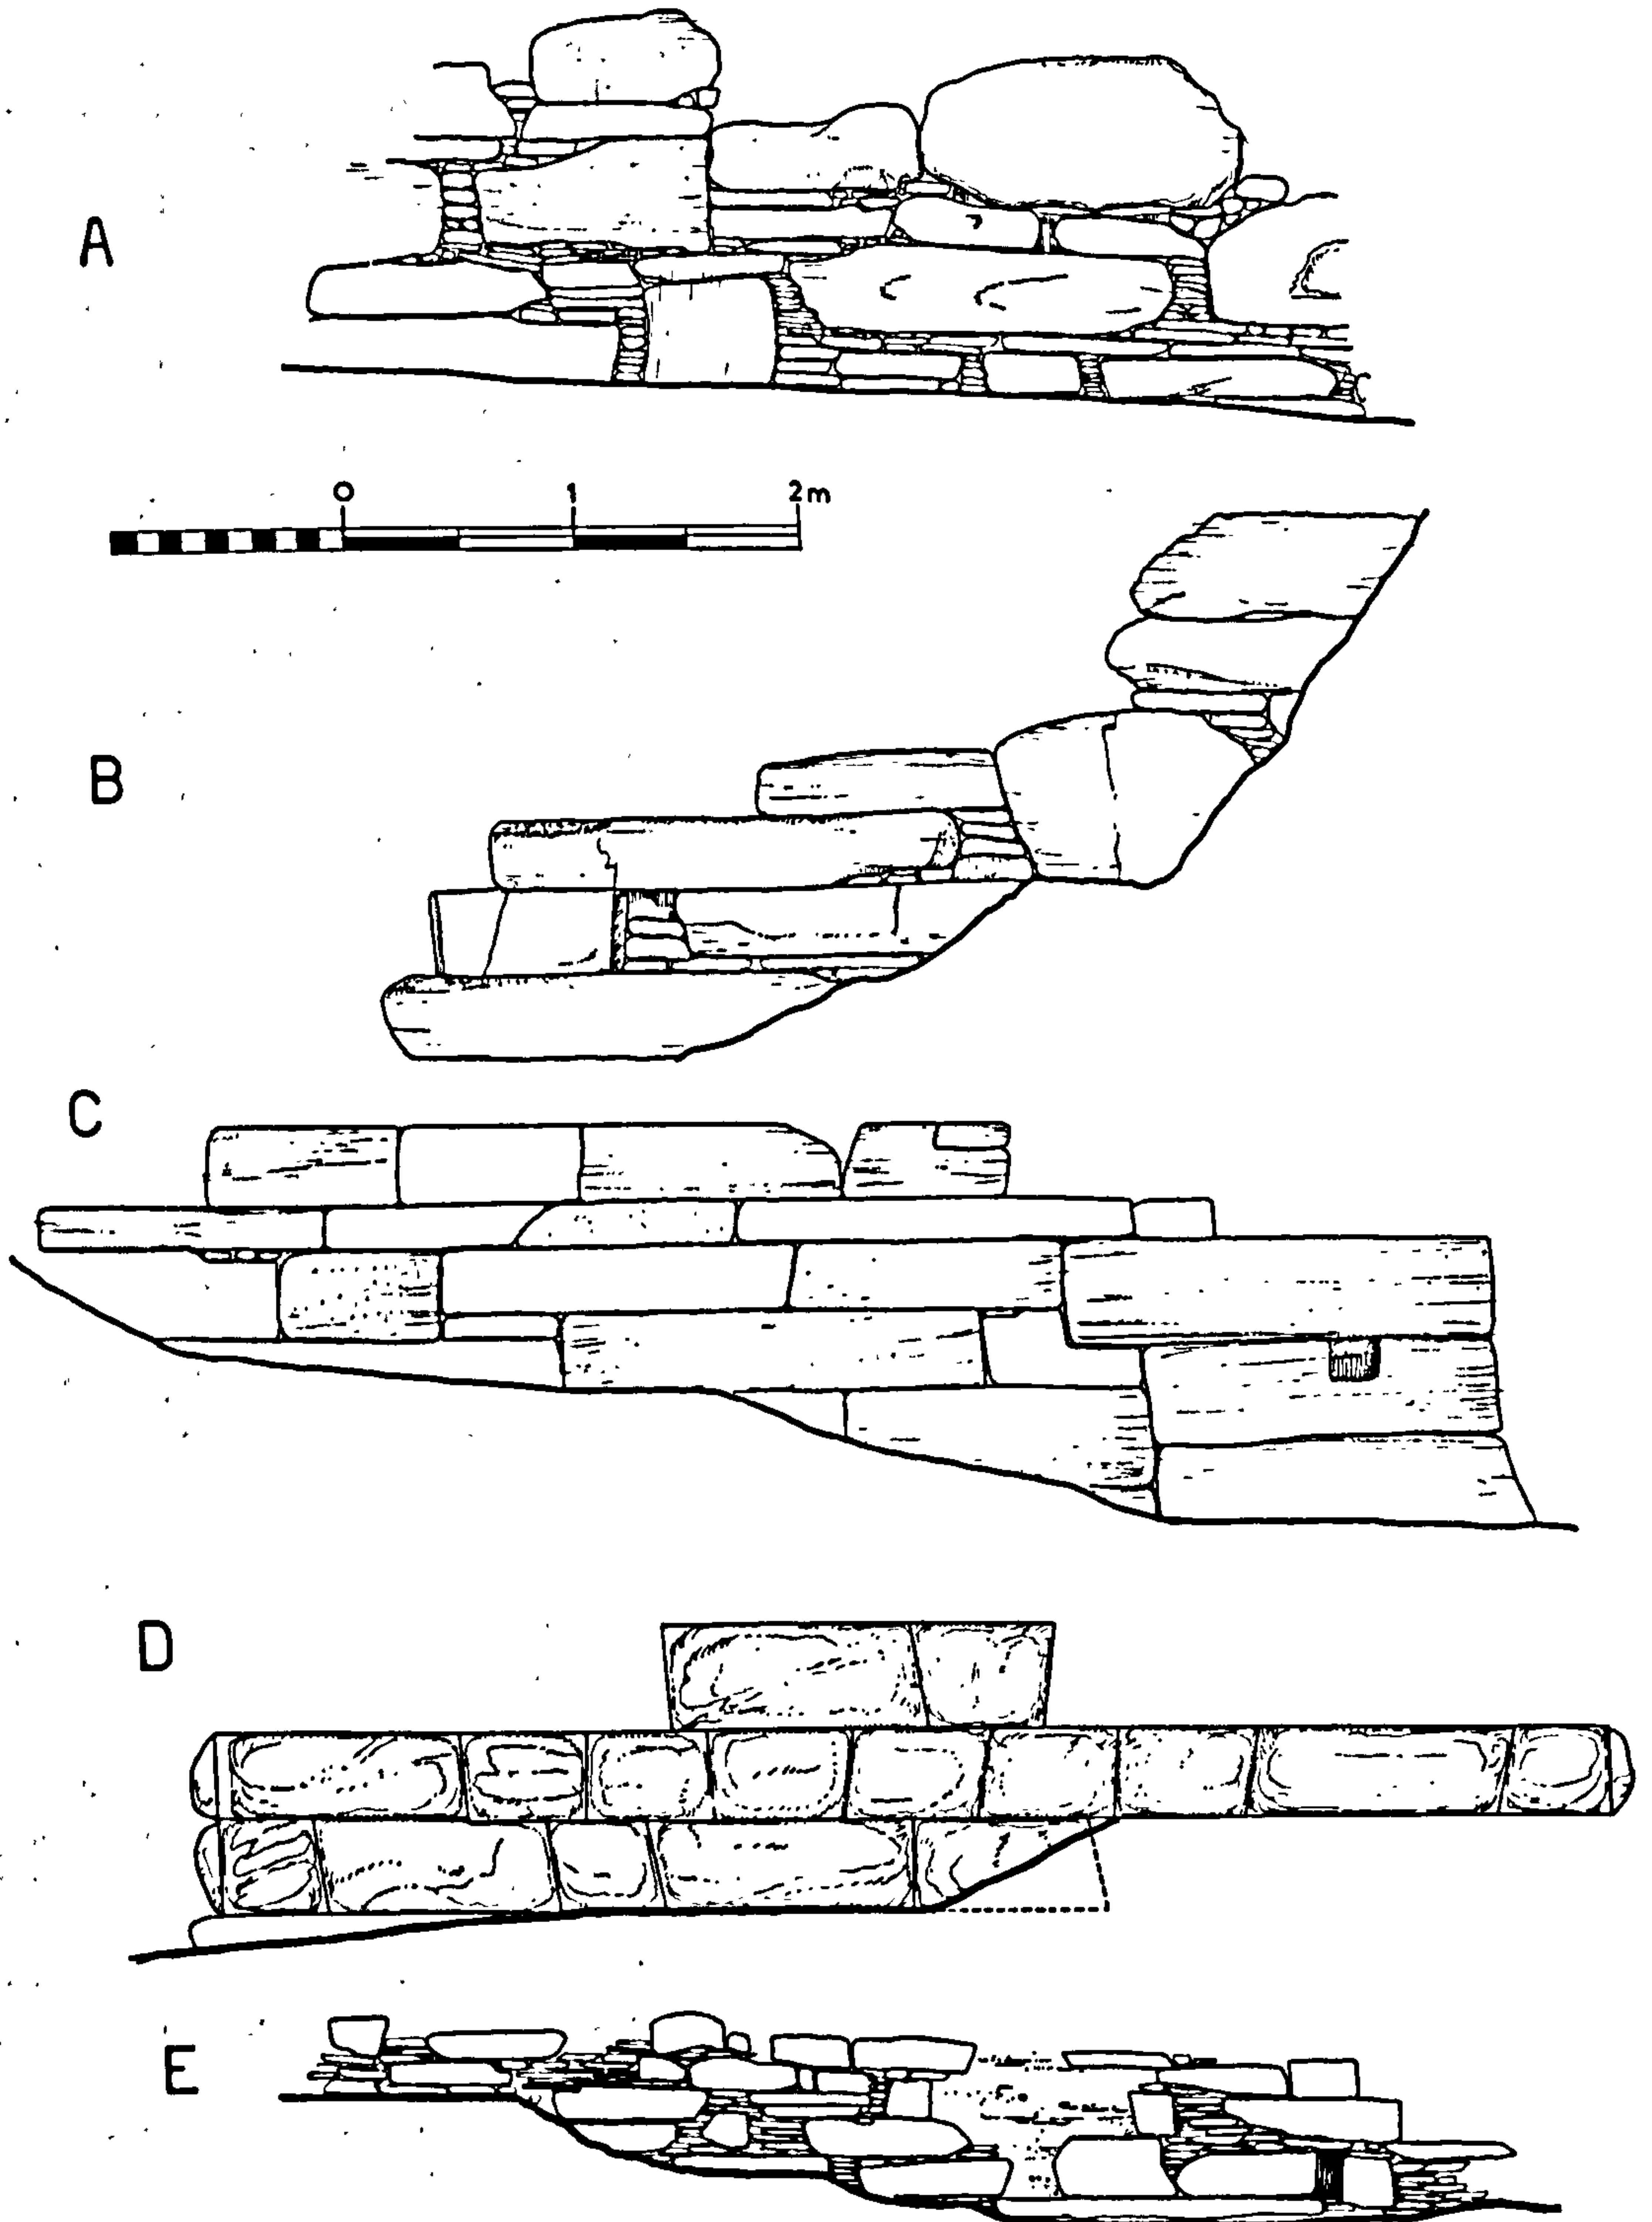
EXAMPLES OF MASONRY FROM NW ANDROS. (a) retaining wall at Hellenikon-Kato Phellos, (b) retaining wall at Hellenikon-Ano Phellos, (c) retaining wall at Kaminaki, (d) tower of Hellenikon-Choreza, (e) tower of Tsouka.
